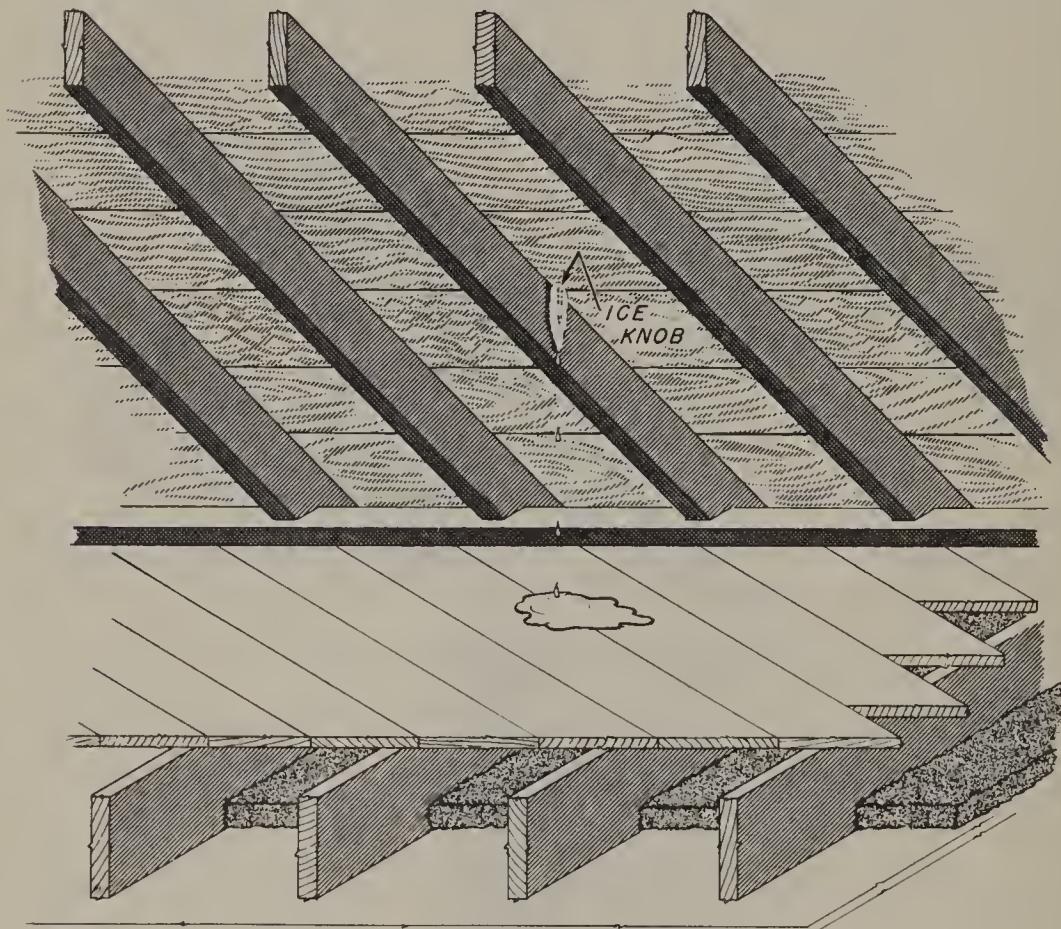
Ice knobs attached to protruding nails.* Frequently in the construction of a building nails are used that are longer than needed or they miss the supporting member in which driving was intended and the points project into the attic or wall. The heads of these nails sometime come close to the outside surface of the roof and since the nails are better conductors of heat than wood they become the coldest surfaces in the attic or wall and condense water. During prolonged periods of cold weather the protruding nails accumulate ice knobs that later melt and stain the ceilings below. As a safeguard against such damage, nails of this kind should be clipped off close to the wood.
